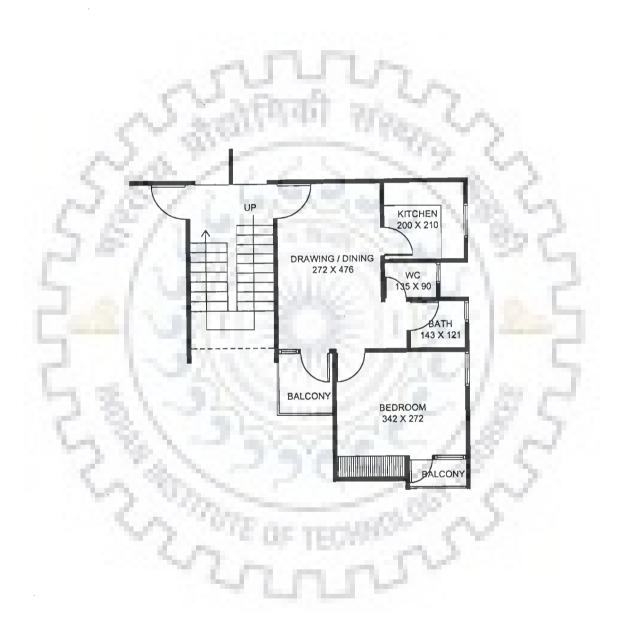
(a) - Typical Floor Plan of Type I, Project No. 16 (Plinth Area of One Dwelling = 47.30 sqm; Floor Area of One Dwelling = 39.70 sqm)
